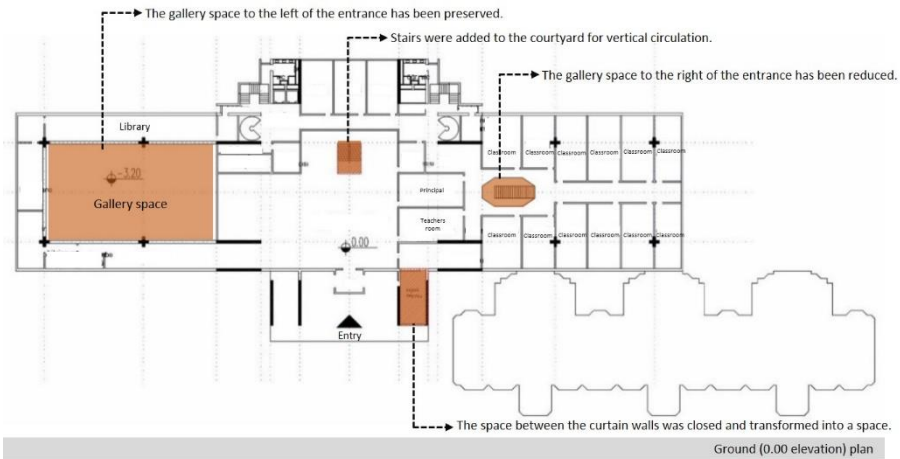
Annex building floor plans [Accessed from plans (Kaymak, 2019)]
